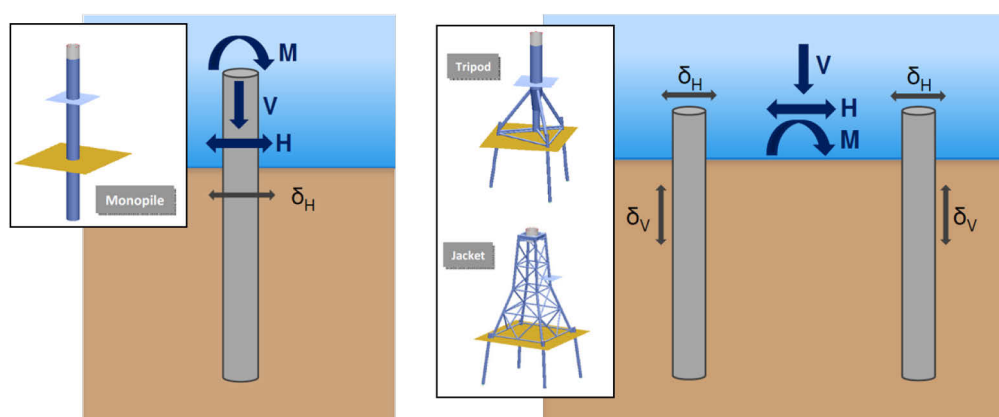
Load transfer to the soil for monopile (left) and tripod/jacket foundations
